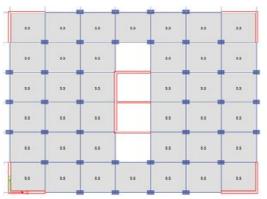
Plan of Building at 10<sup>th</sup> Floor level (LL = 5.5 kN/sqm)
